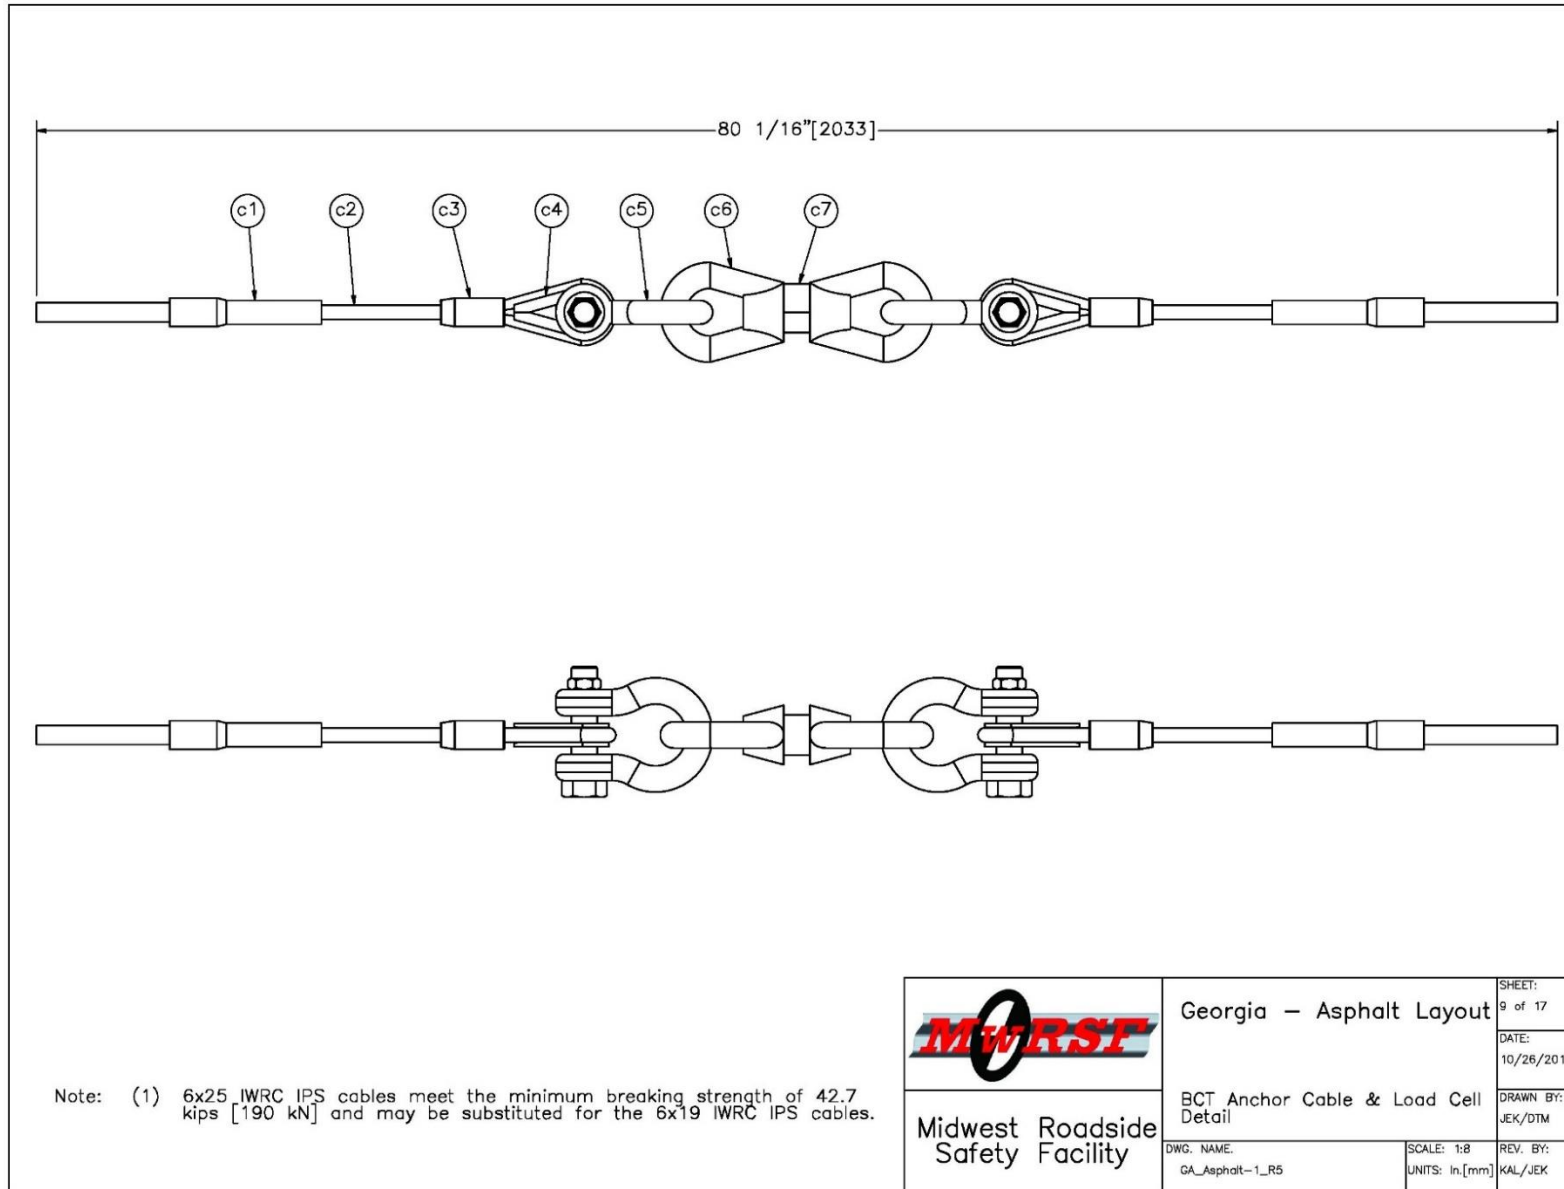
BCT Anchor Cable and Load Cell Detail, Test No. GAA-1
